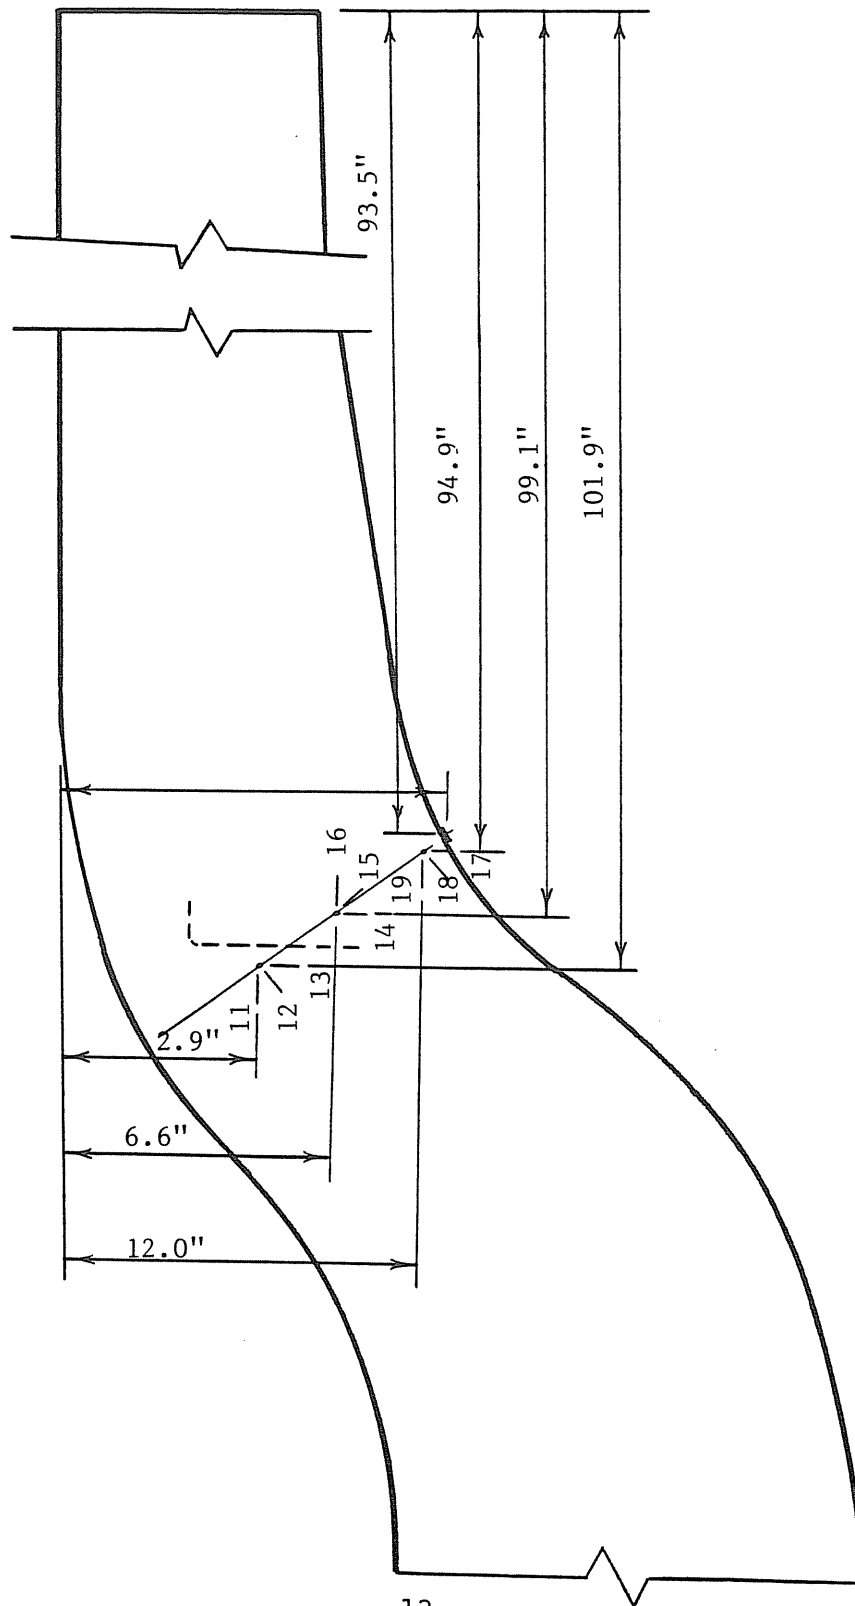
Locations of Strain Gages on Outside of Beam Web
